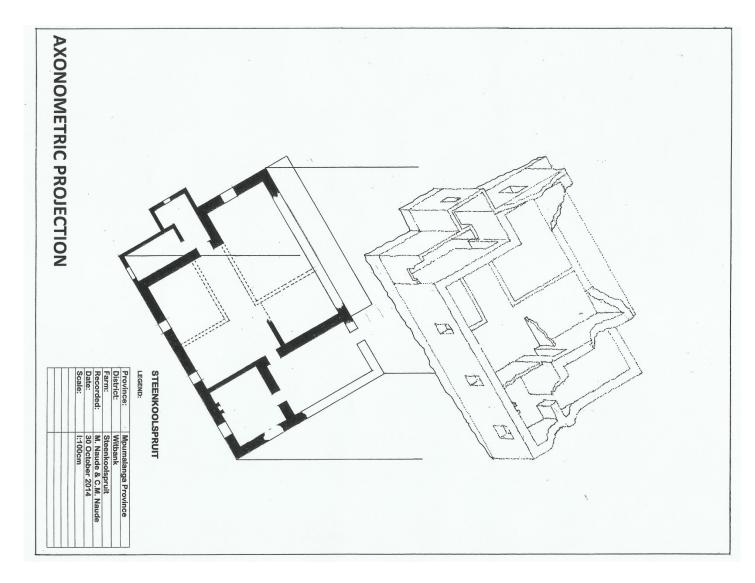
Axonometric view of the ruin indicating the floor plan layout and condition of the dwelling (Drawing: M. Naude 2014)
